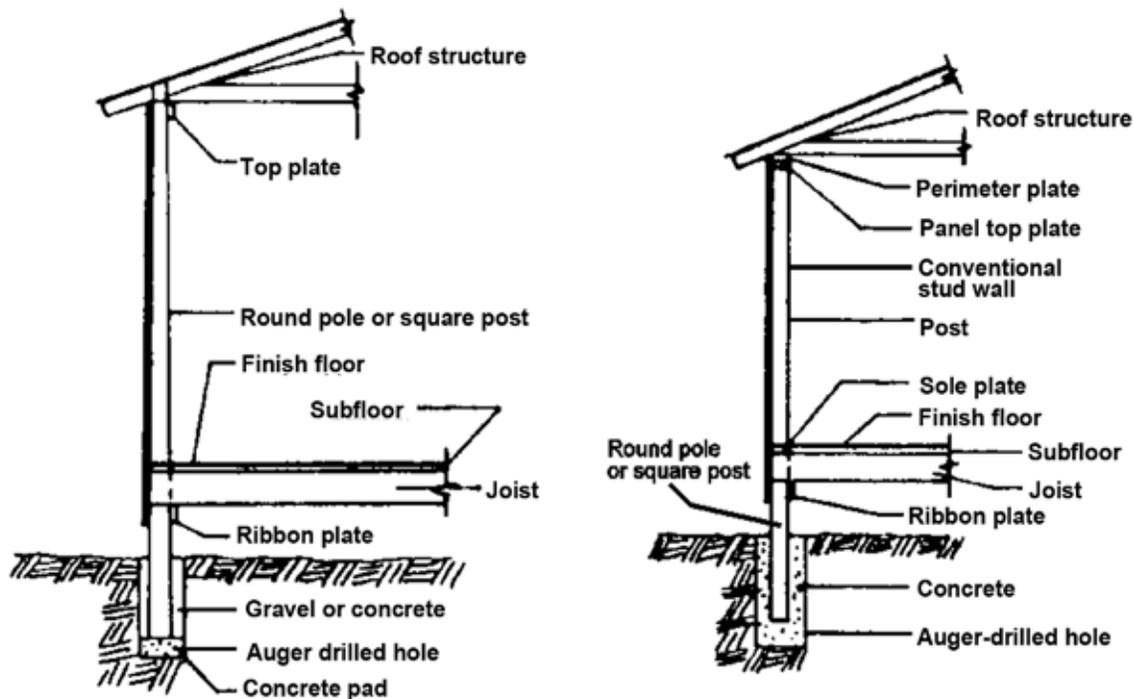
Pole and post-frame buildings: (left) pole or post forms both foundation and wall; (right) pole or post forms only the foundation for conventional platform-framed structure.
